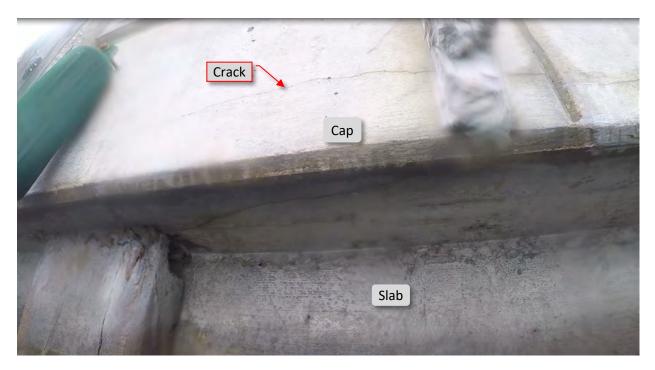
P43. STA 5+93 - 6+00. Crack at vertical face of cap.
